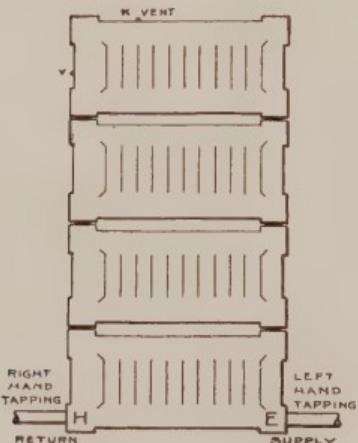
Assembled Four Horizontal Sections in Four Tiers Water
